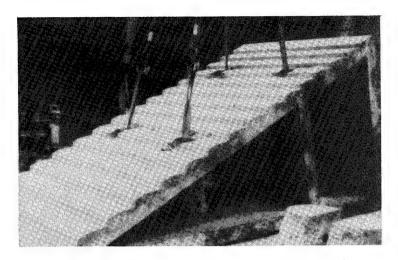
Typical precast concrete module used to create man-made reef (from *Public Works* 1991)
